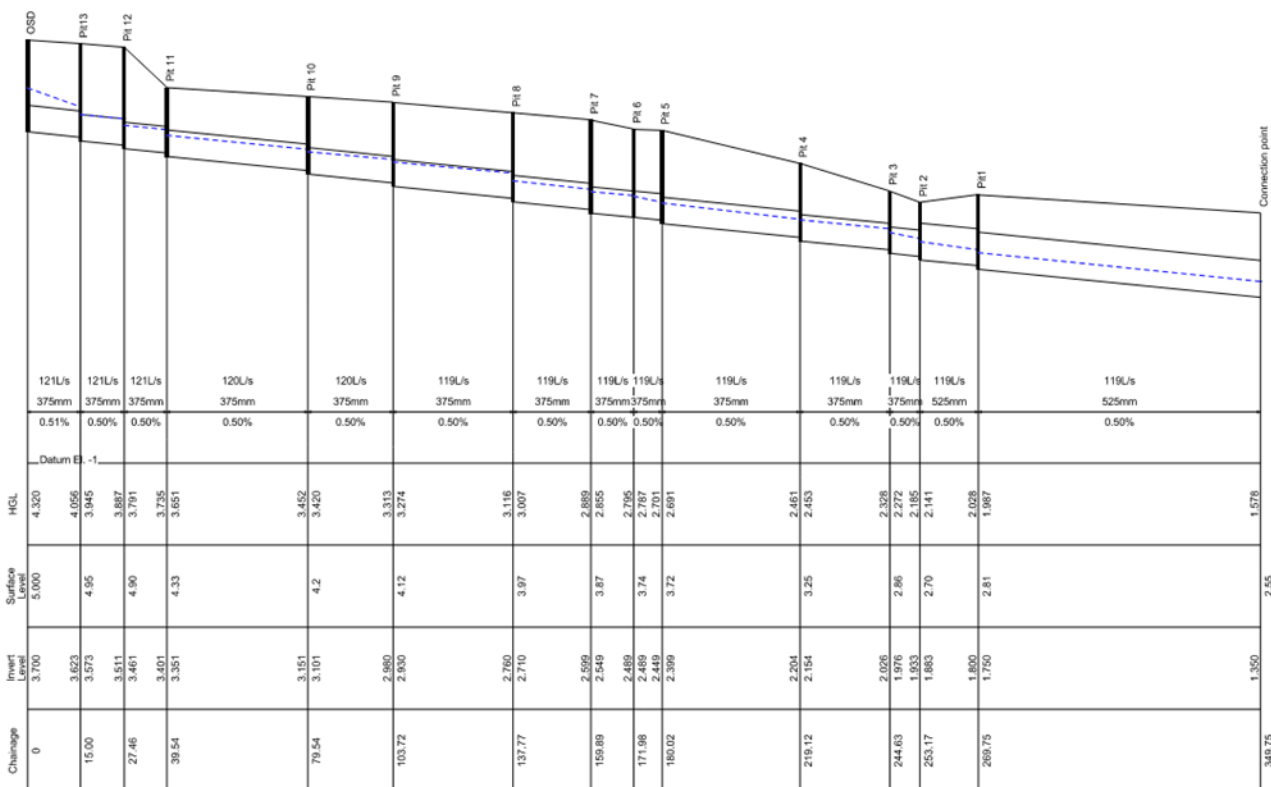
Longitudinal Section of Proposed Stormwater Pipeline – 5% AEP Event (Including Hydraulic Grade Line)
